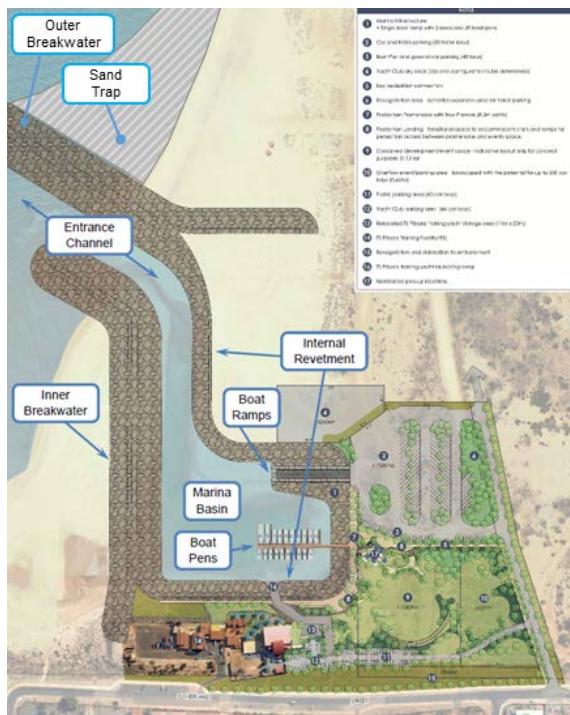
Initial Concept Layout plan for proposed Spoilbank Marina (TBB, June 2018)
